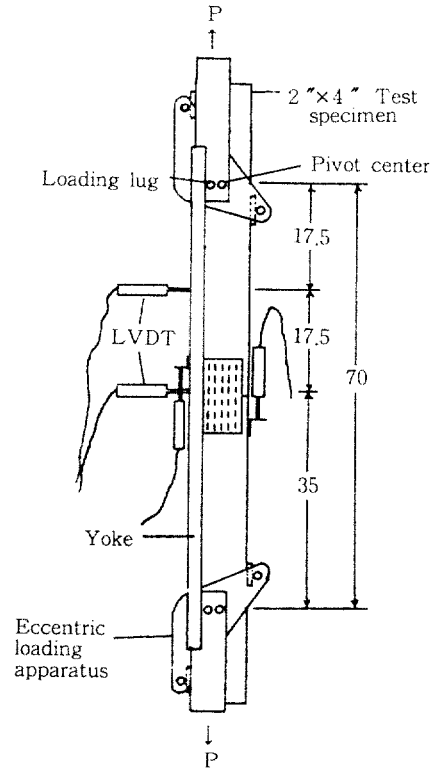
Joint test arrangement under combined load by improved eccentric loading apparatus by authors (unit: cm).
